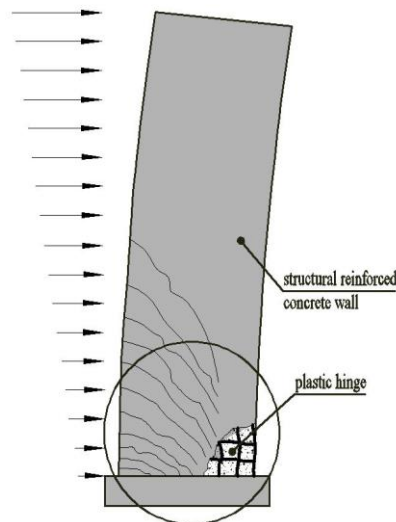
Destruction of reinforced concrete walls at horizontal seismic action.
